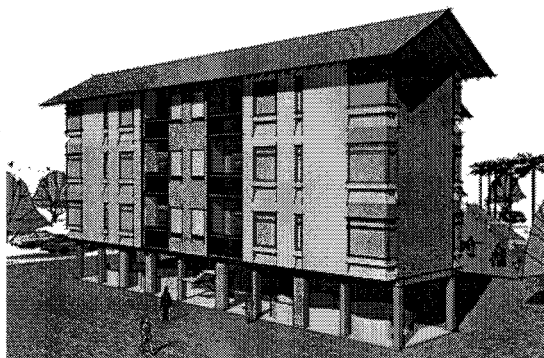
A Proposed Multi-Story Building with Concrete Framework and Open Space at the First Floor Level.
